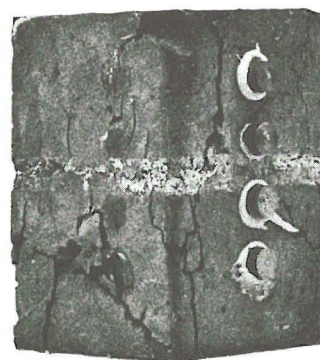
"Cascina Marchesa" Sample of masonry after failure.
